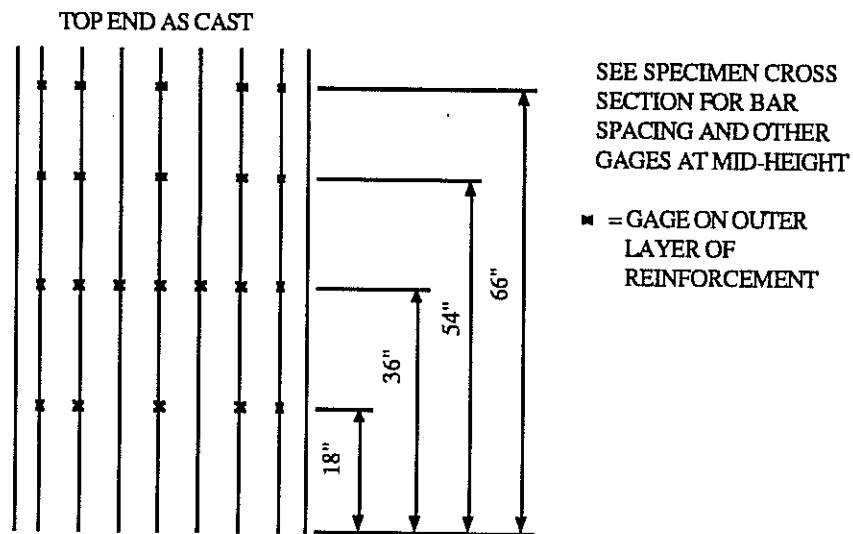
Gage Positions on Compression Face, Specimen 2M10
